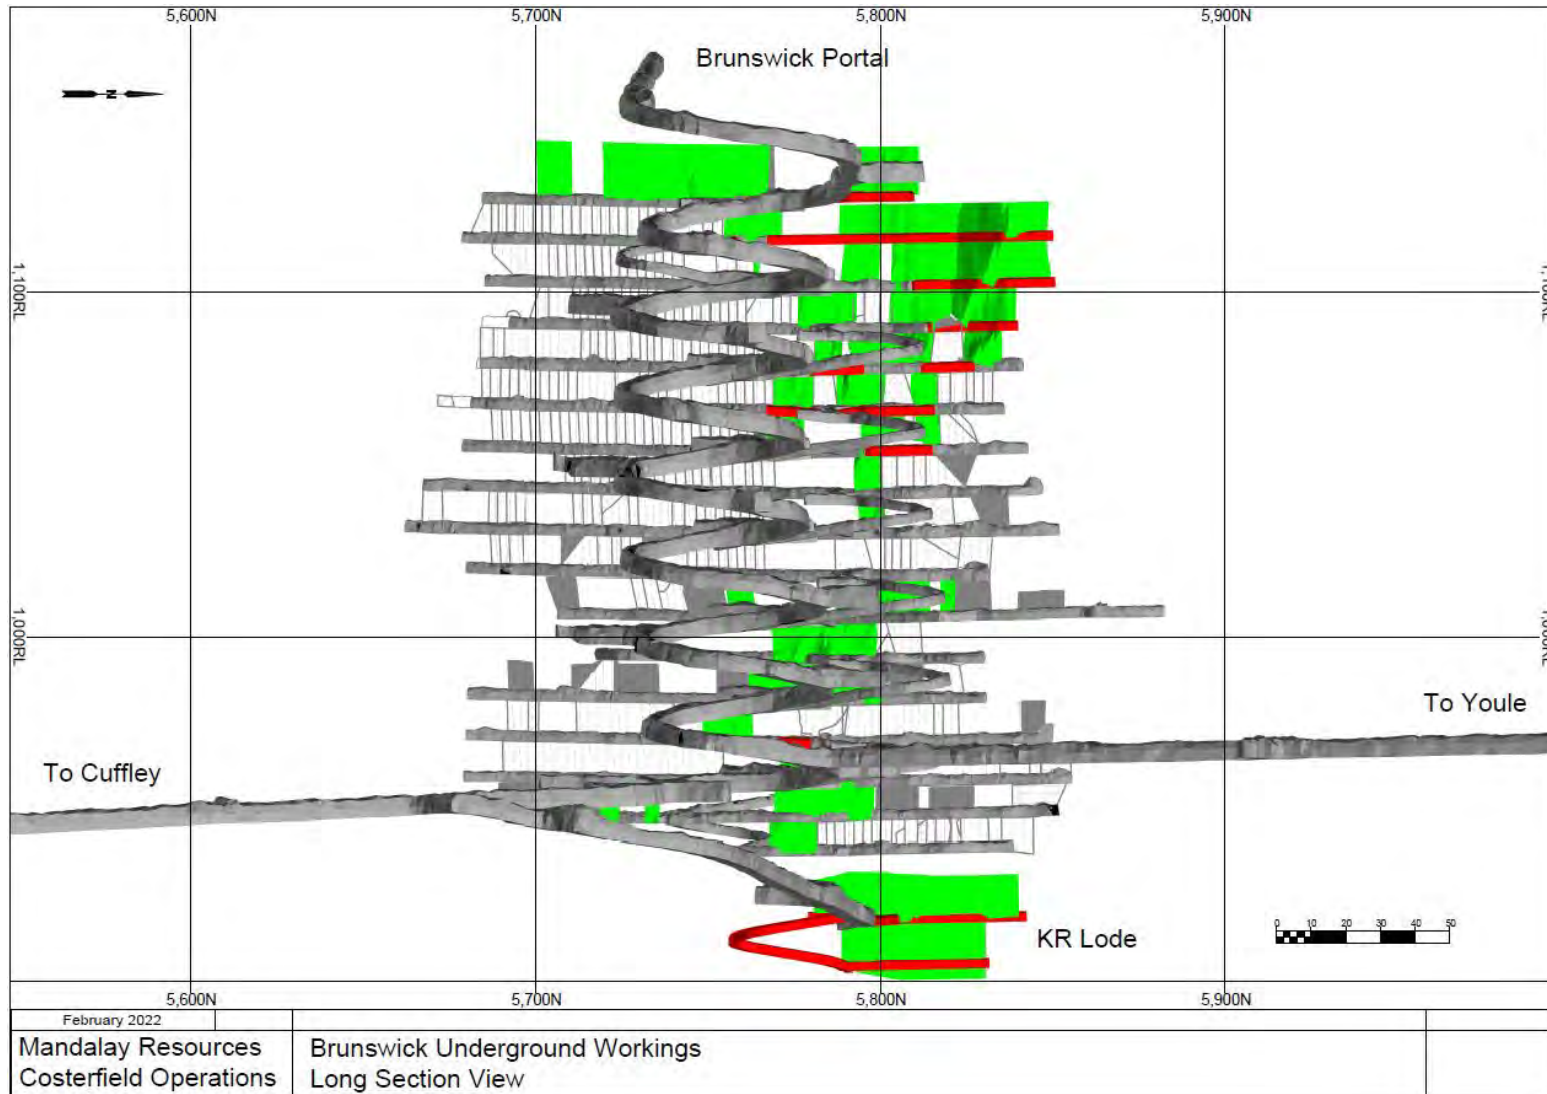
Long-section of Brunswick Mineral Reserve mine design (Red - planned operating development, green – planned stoping, grey – as built)
